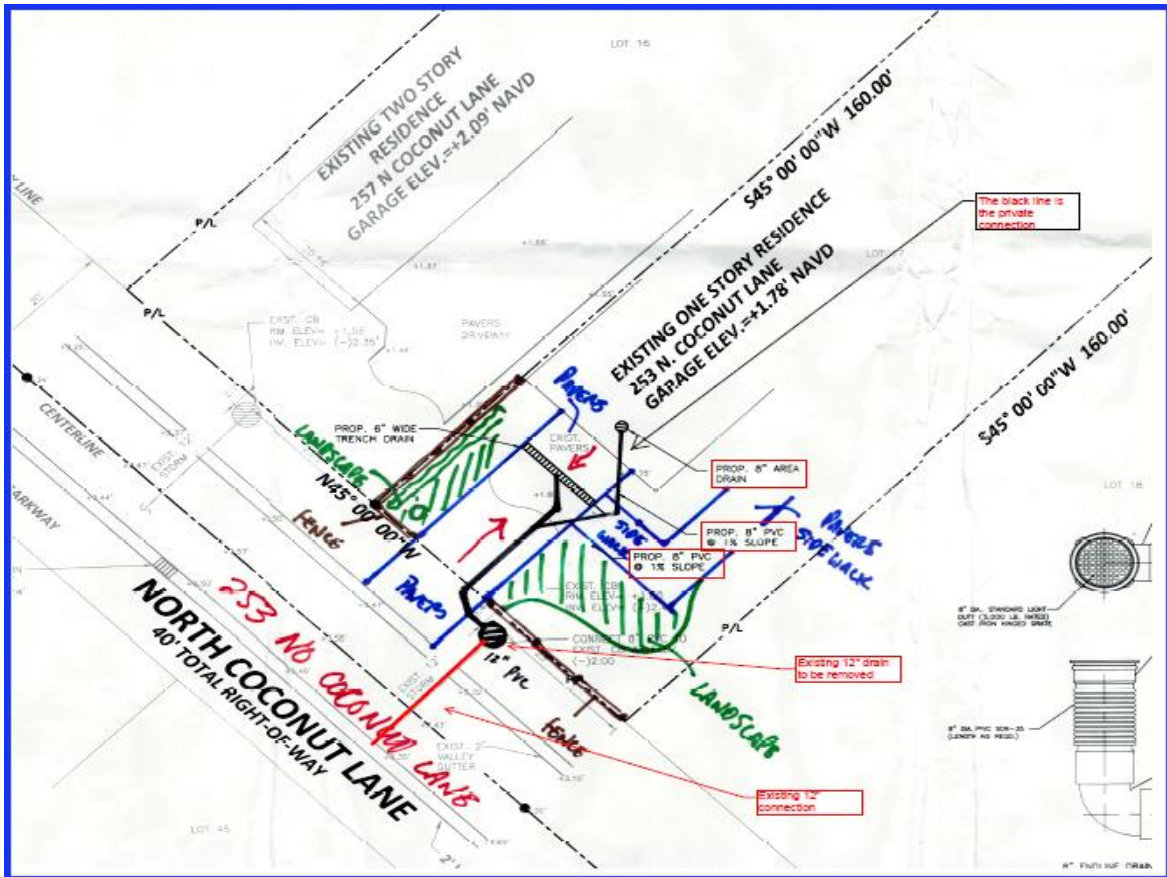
Construction plans approved by Public Works for installing two private-side yard drains at 252 North Coconut Lane and connected to the City drainage system by a drainpipe in the right-of-way.
